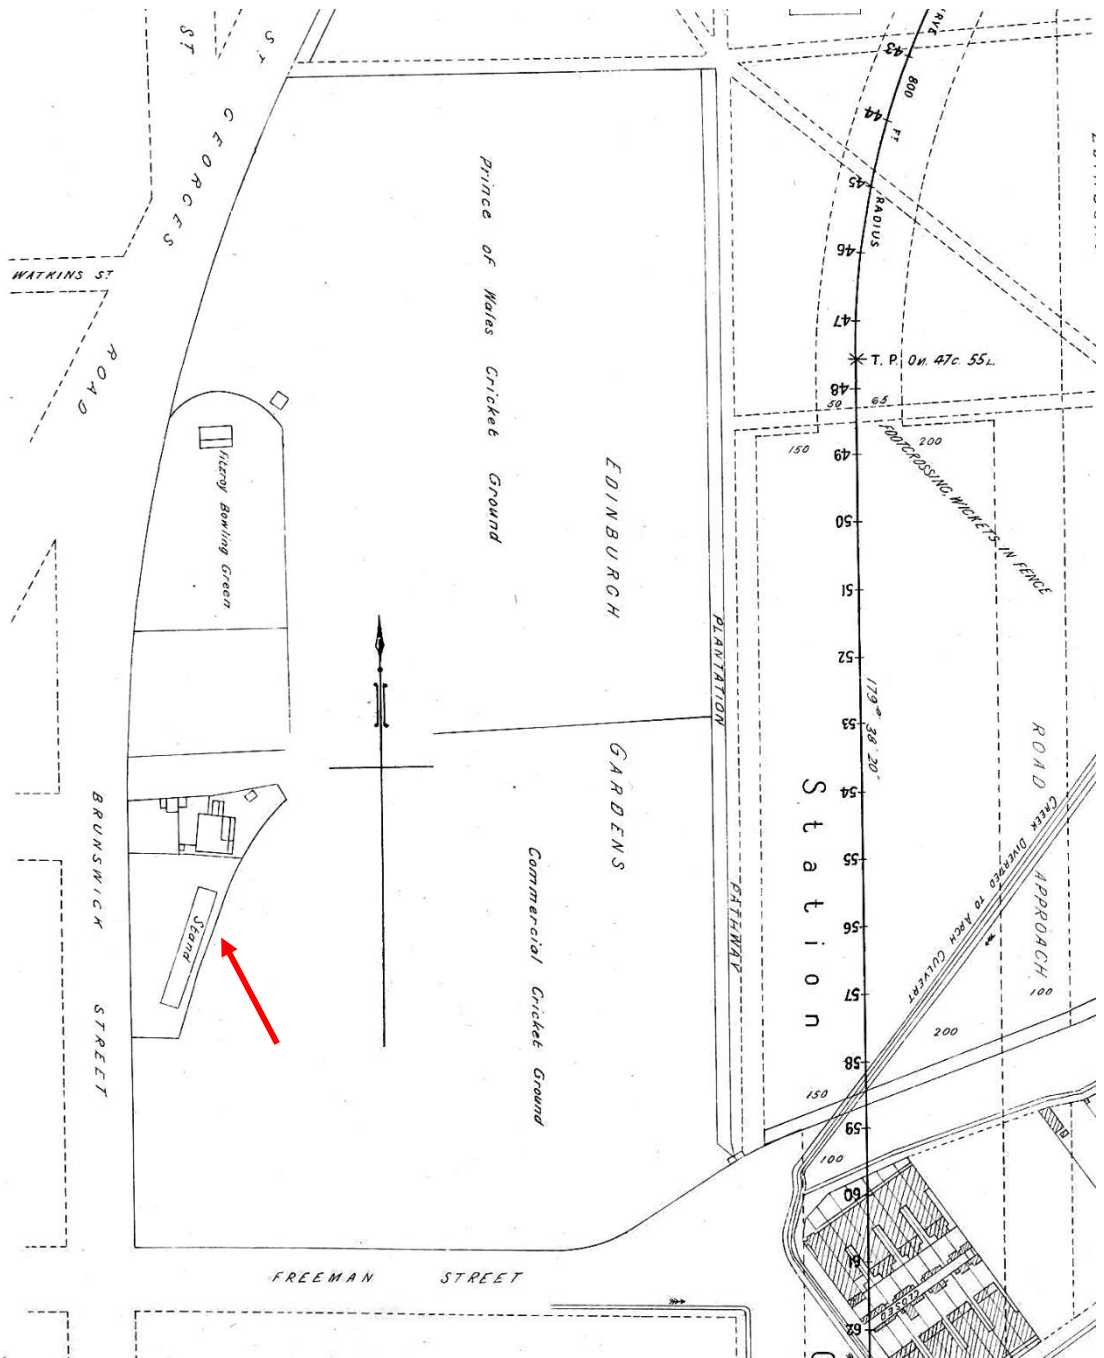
1885 Railway Department plan showing pavilion, fenced members reserve areas and a stand at the north-west corner of the oval (red arrow), adjoining Brunswick Street
